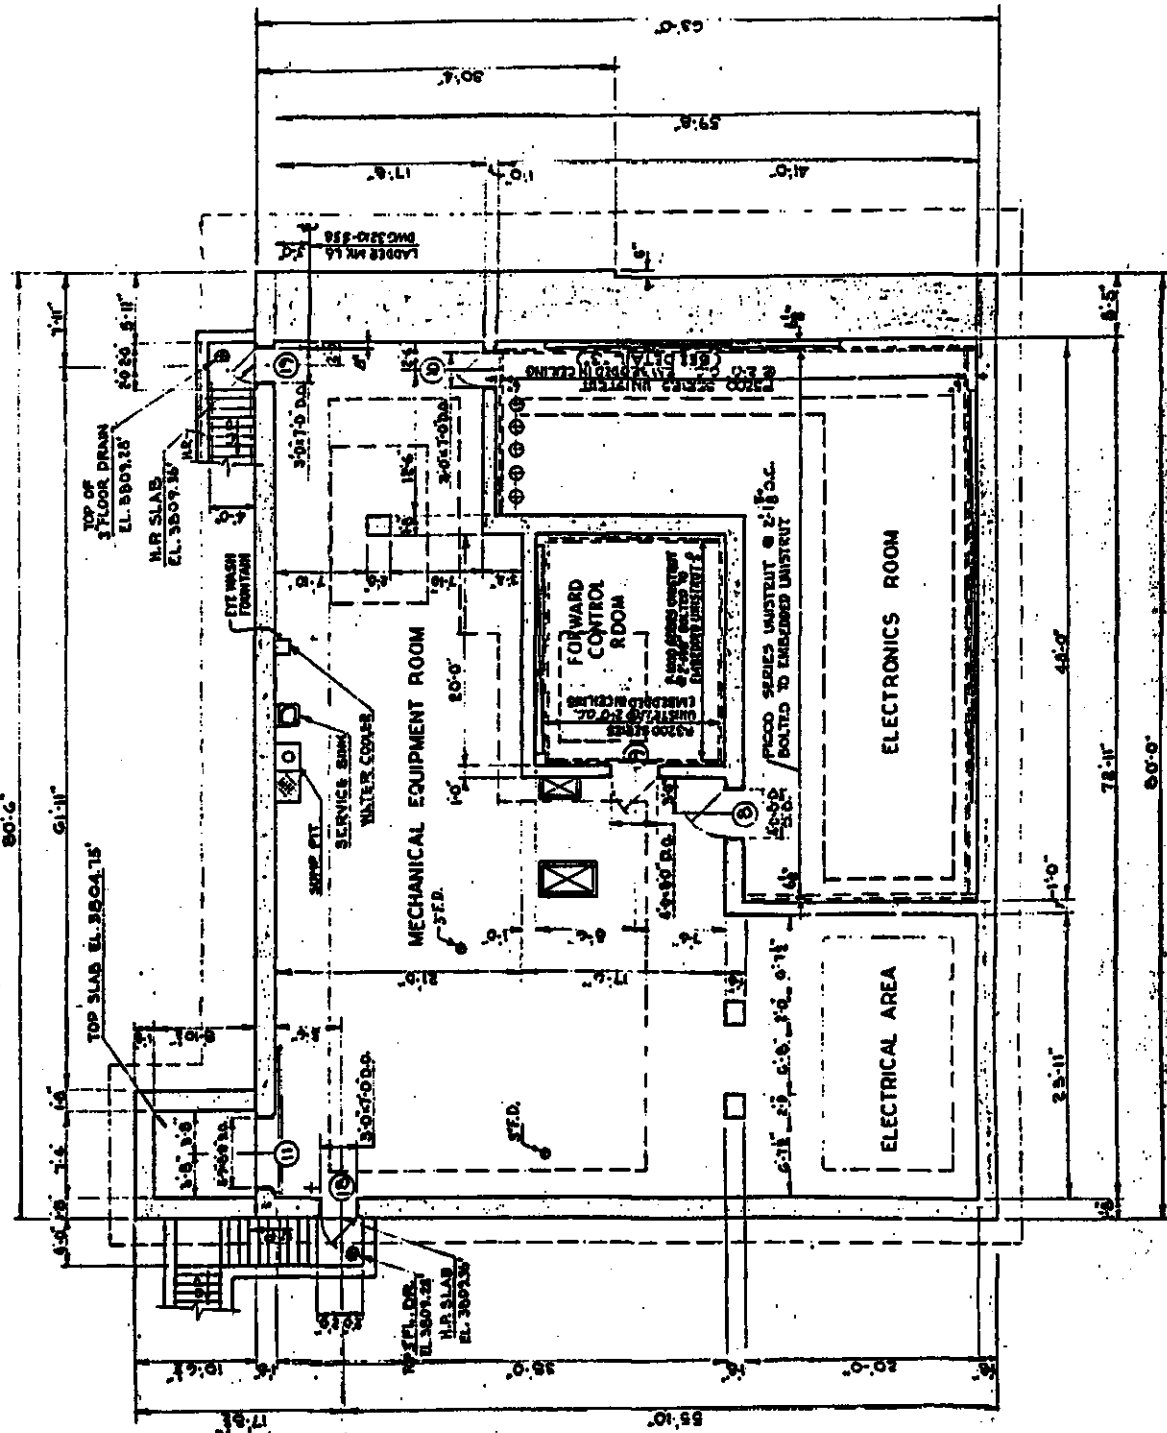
Test Cell C, Building 3210, Basement plan, ca. 1960.
